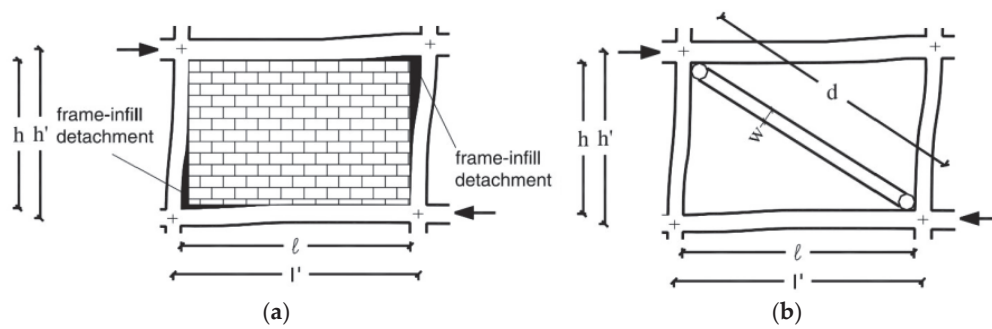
Infill walls under horizontal load: (a) actual system, (b) simplified model.
